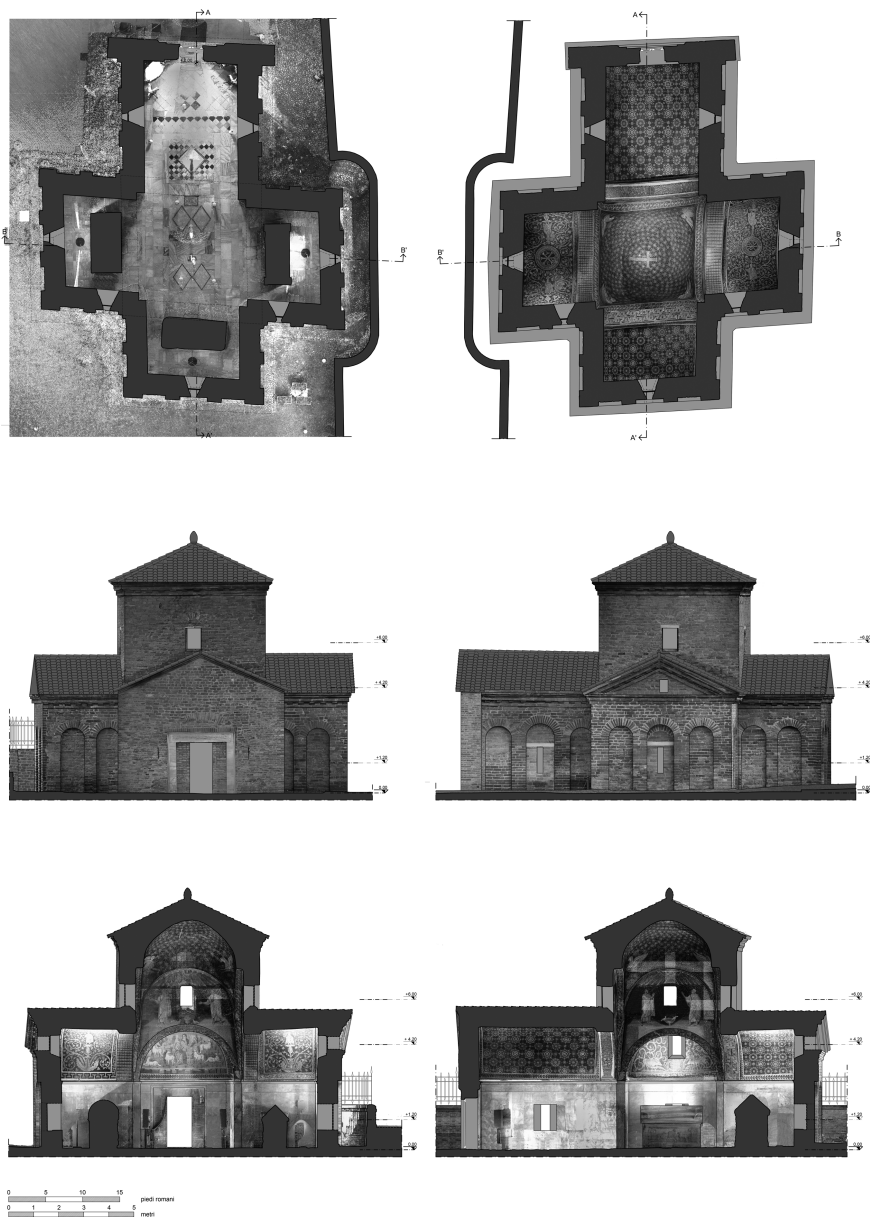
Plan of the ground floor, +1.20 m; plan of the dome; material restitution of North and West elevations (by photomodelling software); material restitution of sections AA' and BB' (from the pointcloud) (drawings by G. Lavoratti)
